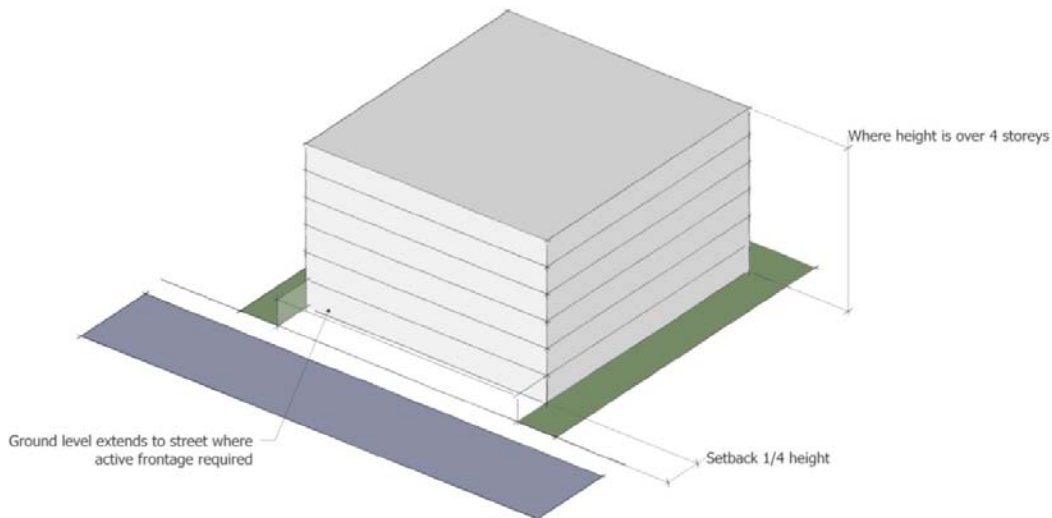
b – Setbacks for buildings greater than four storeys adjacent to a non-residential zone
